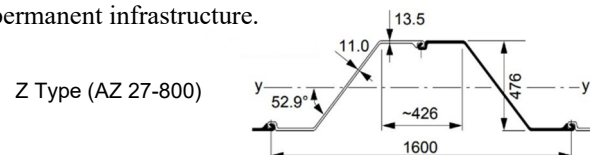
Wider Type of Steel Sheet Piles (Z type)
